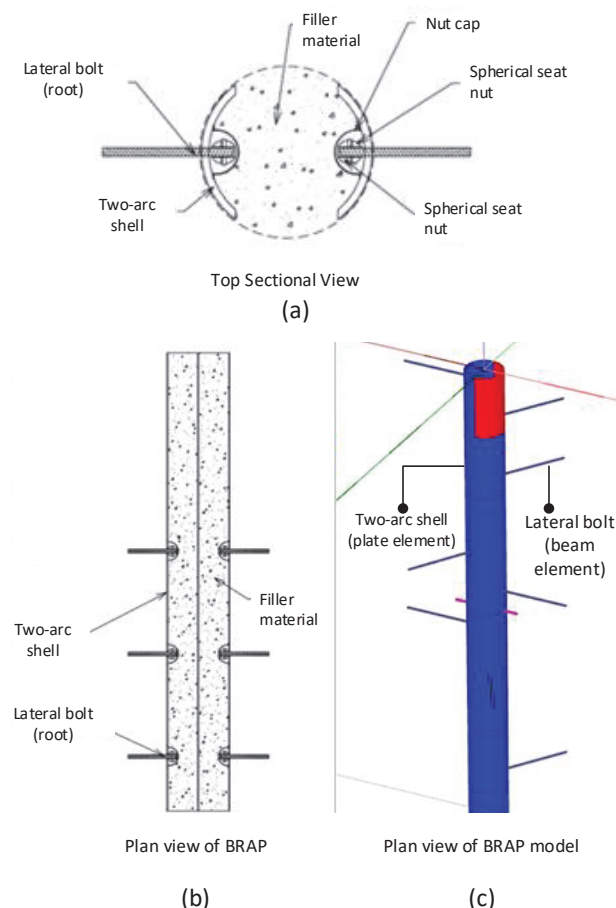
Schematic diagram of BRAP (a) top sectional view, (b) plan view, and (c) model plan view.
